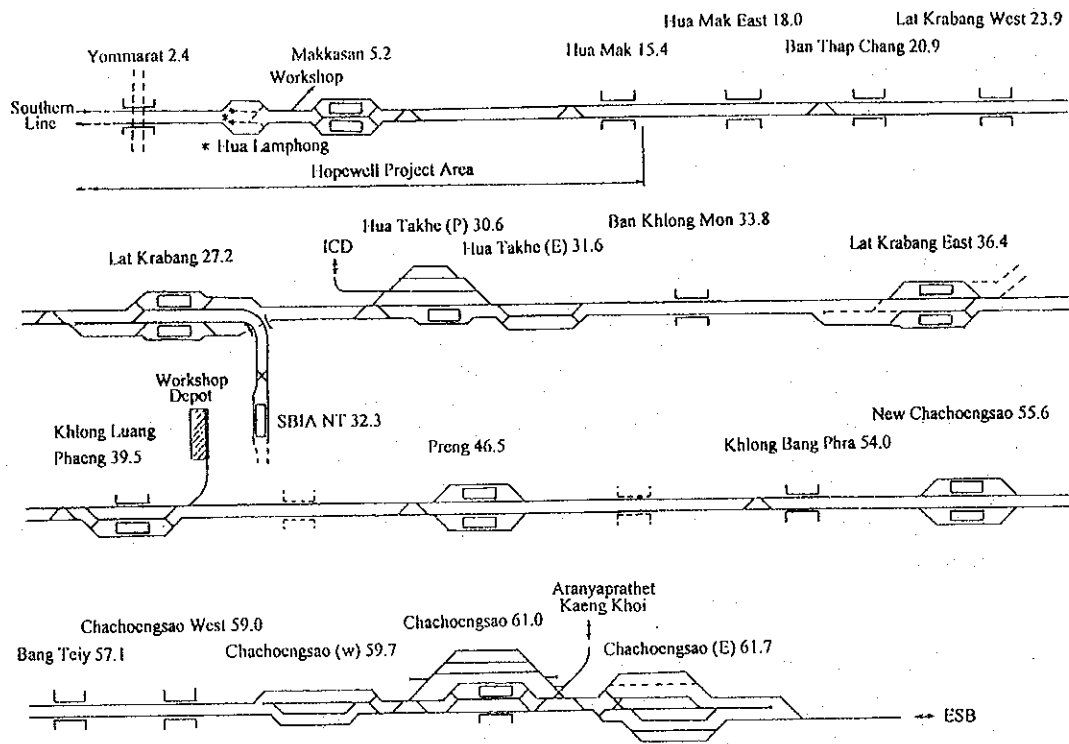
Station Track Layout (Yommarat - Chachoengsao)
